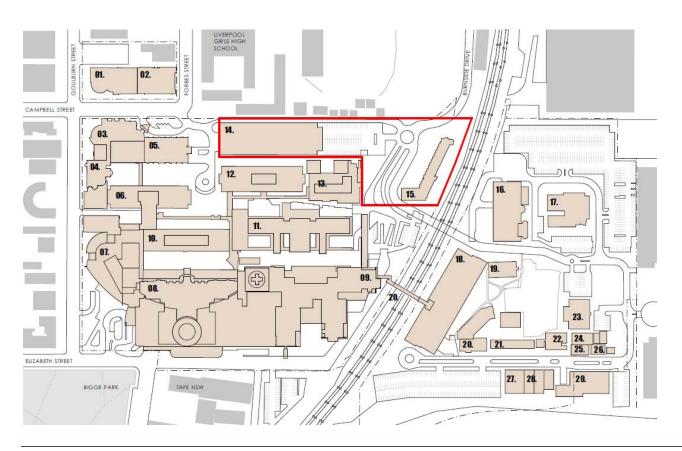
Site location outlined red Source: Fitzpatrick and Partners
